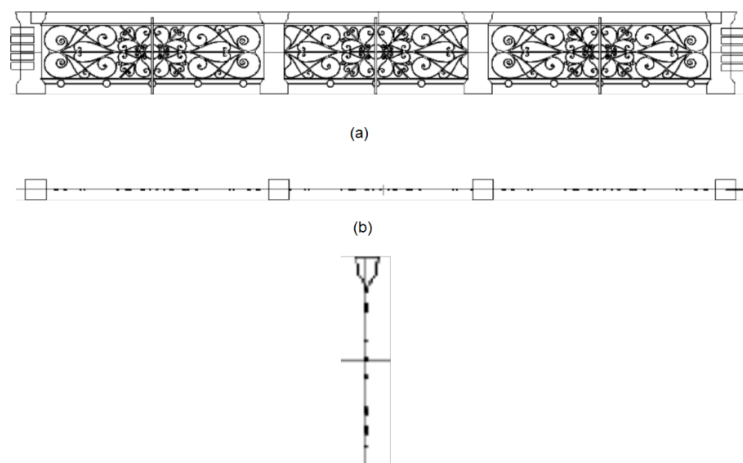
Slice sections of Balcony Railing in Planes (a) XY plane (b) XZ plane (c) YZ plane
